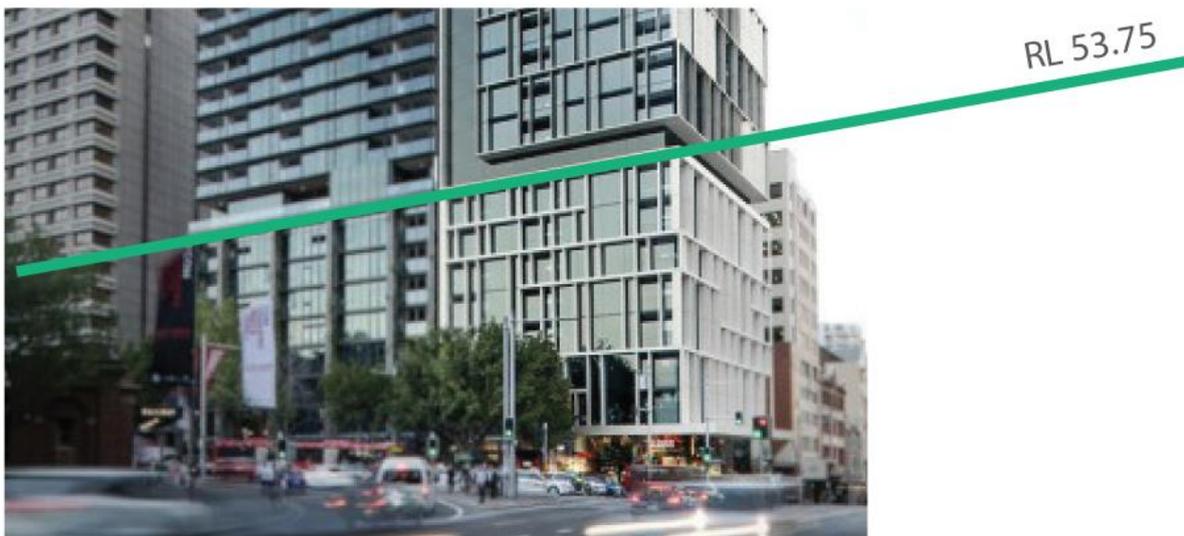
Extract from the 'Revisions to Stage 1 DA - Design Report ' (Crone Architects), identifying the 25 metre expressed street wall datum at approximately RL 53.75 AHD across the site
